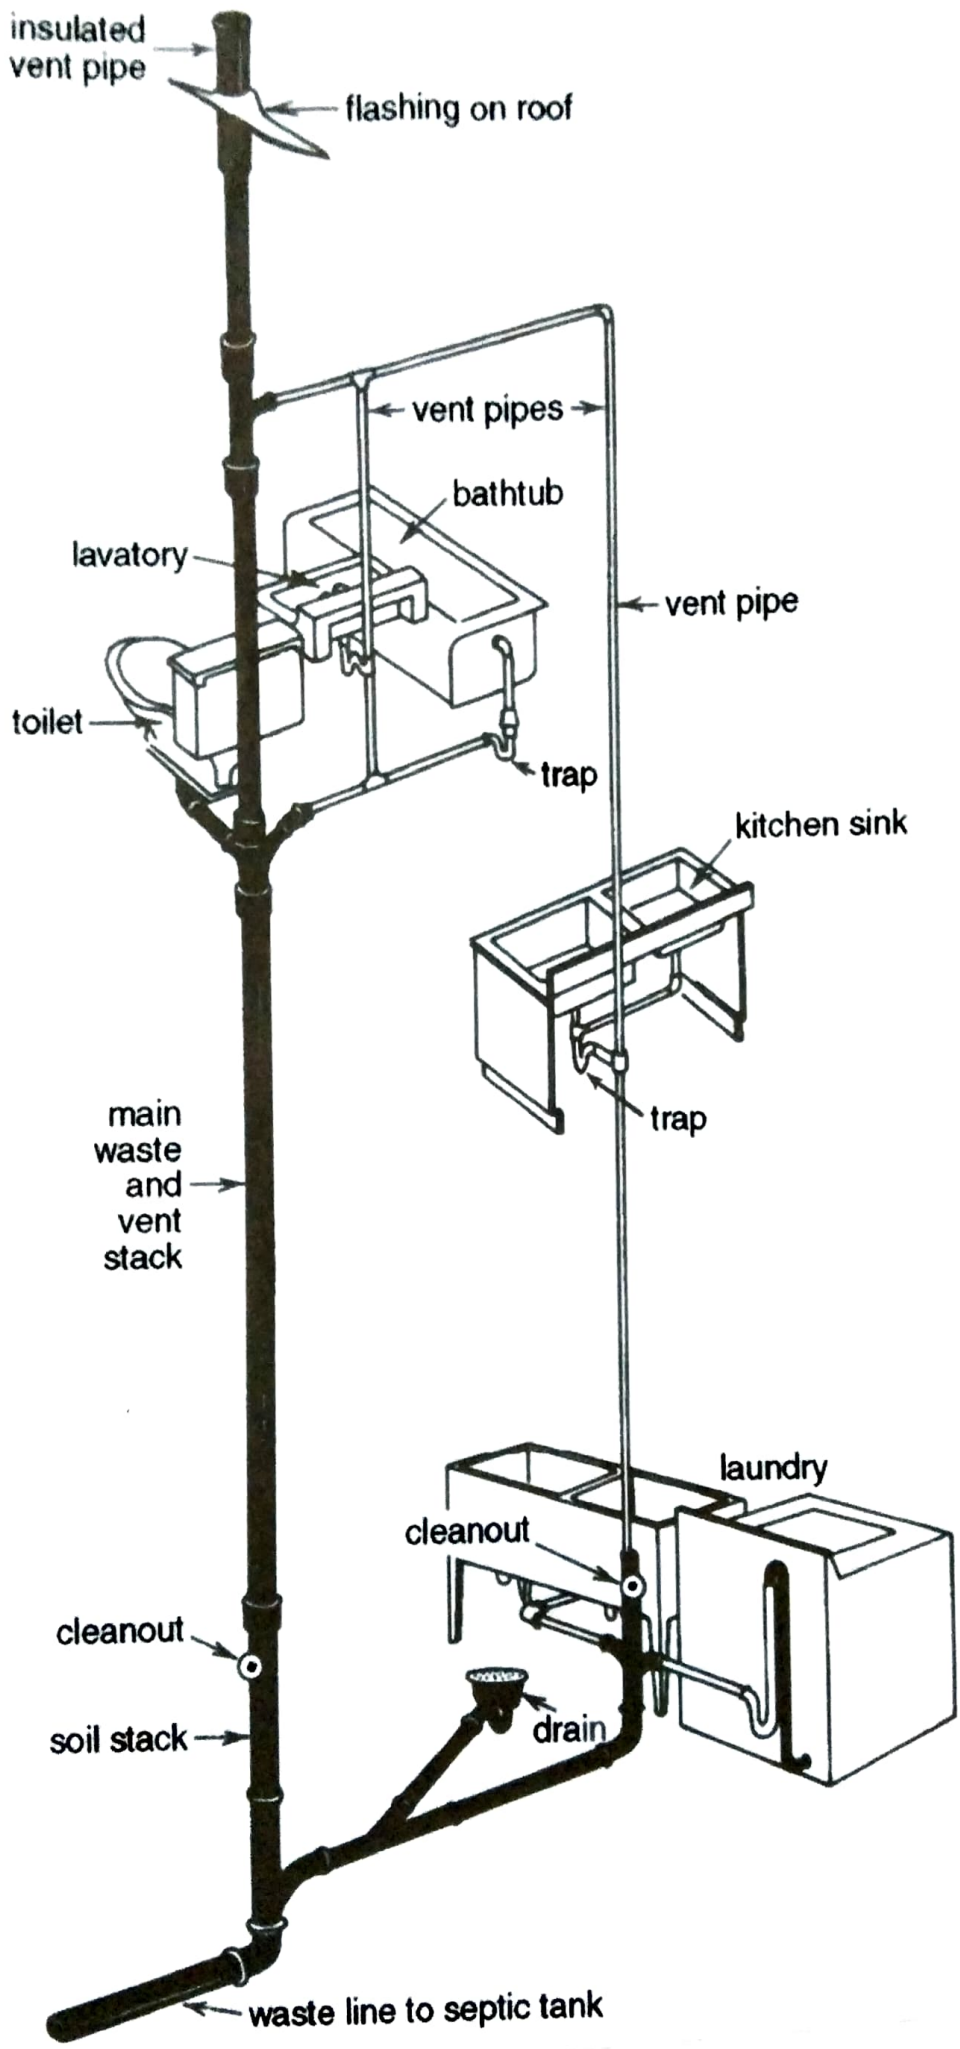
House plumbing includes waste and vent pipes, as well plumbing fixtures.
